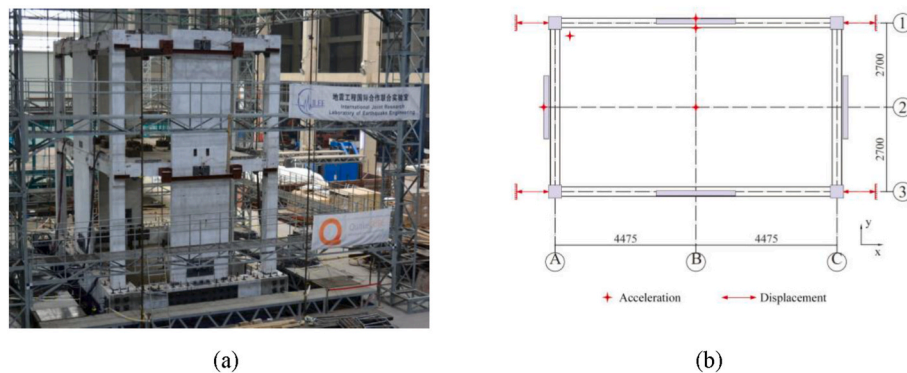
The full-scale shaking table test model of a two-story low-damage concrete wall building structure. (a) Shows the photo of the test building; (b) shows the selected sensors (Henry et al., 2021).
